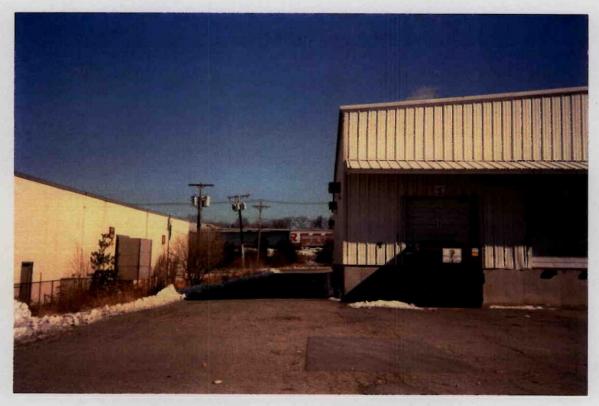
Rear Portion of 238 Bodwell Street (Note: View Facing East)
